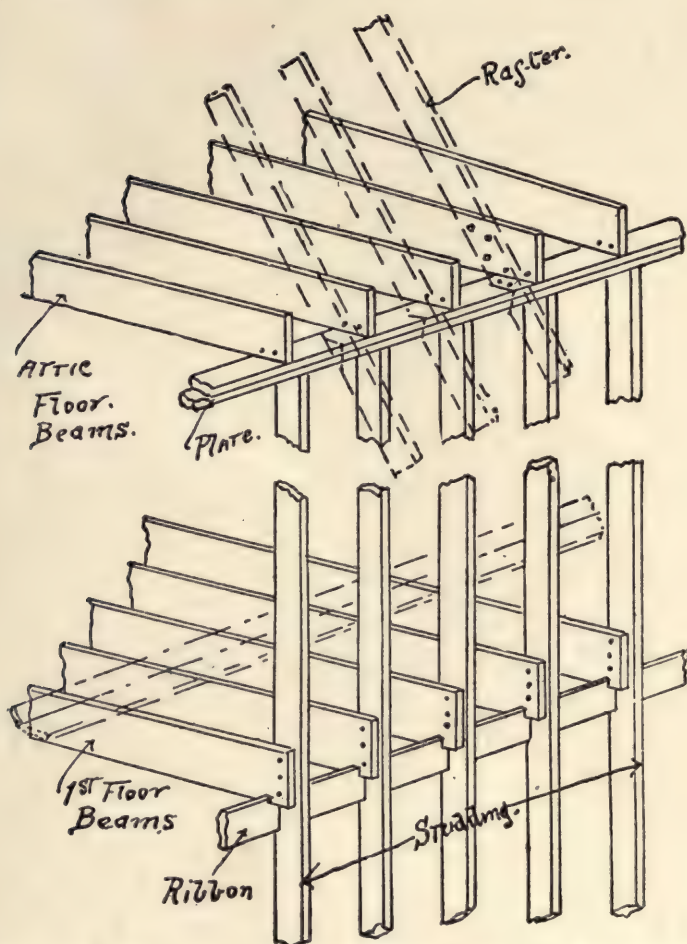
Floor Joists, Studs and Rafters Framed Together for a Balloon Frame.
